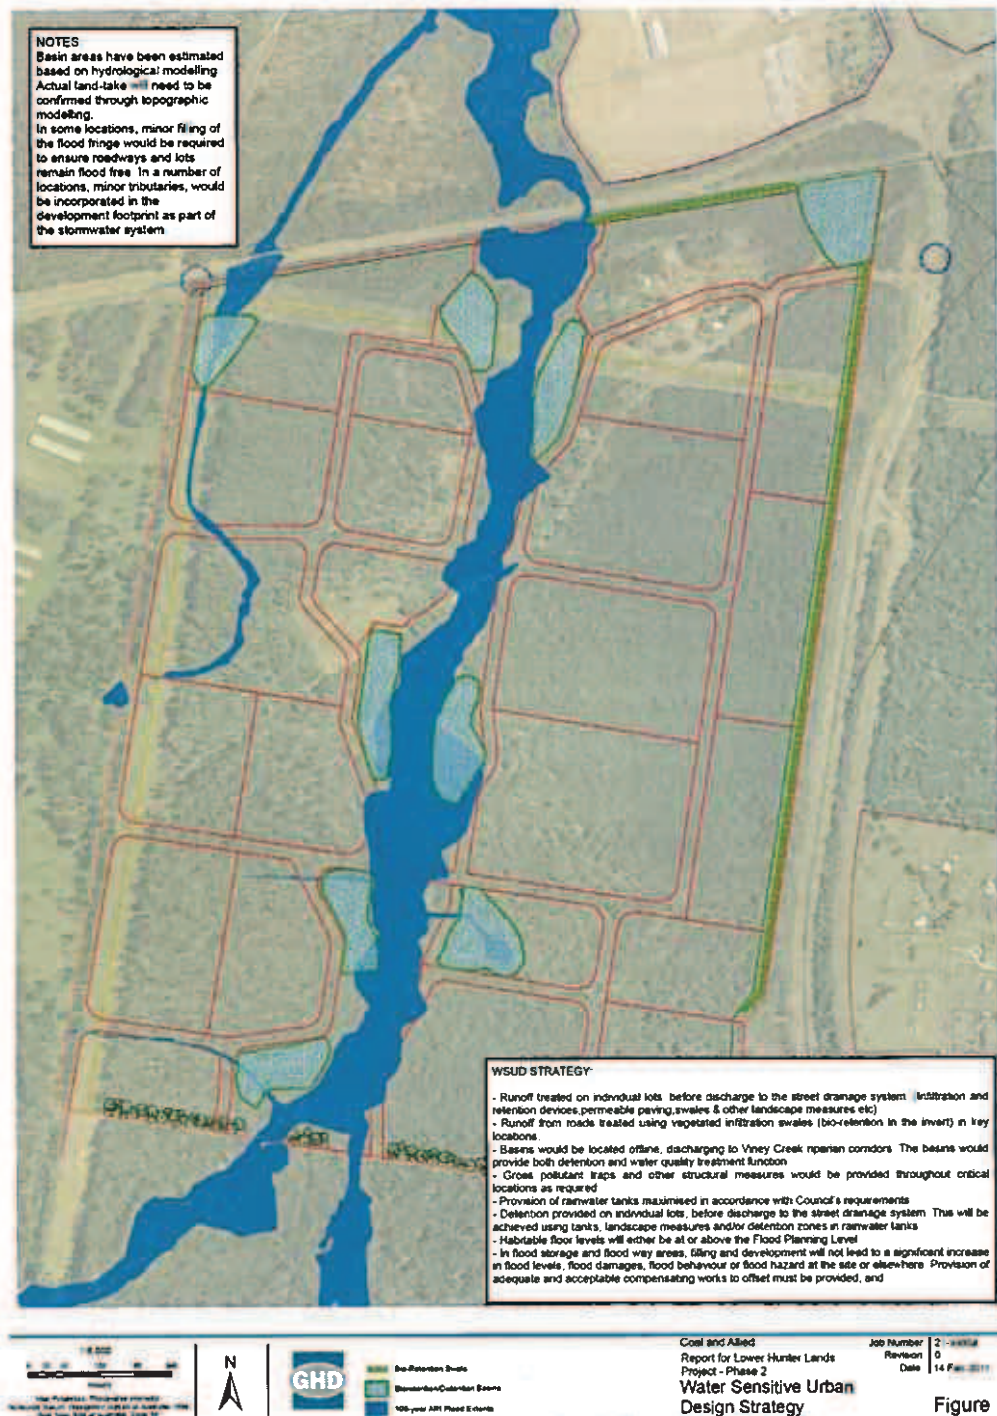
Water Sensitive Urban Design and Flood Hazard
